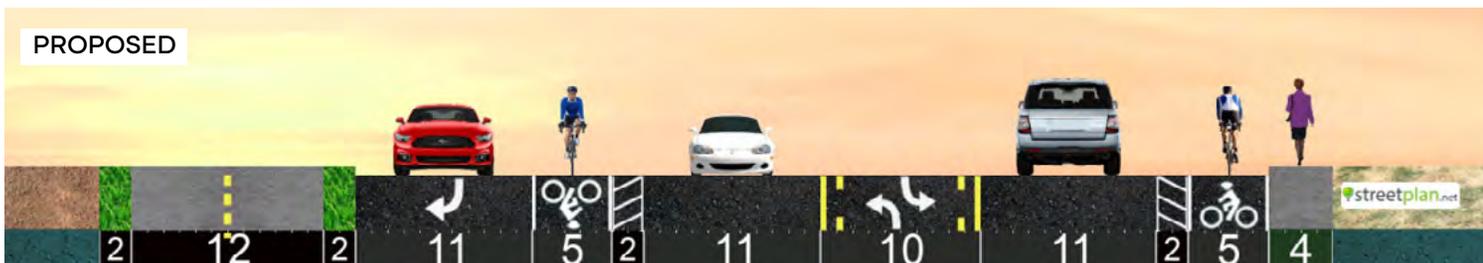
Concept: LOVR between Pecho Road and Monarch Grove Elementary School, looking east
